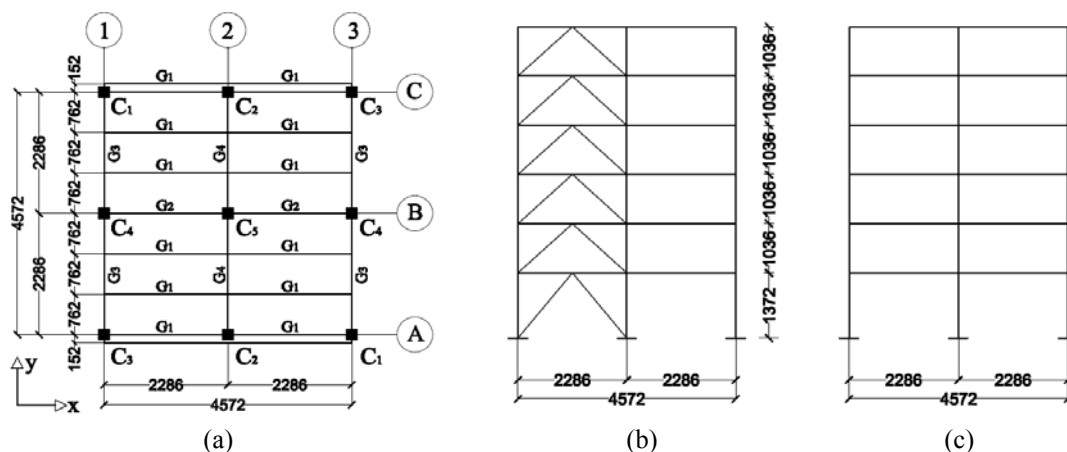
Test Uang and Bertero (1986): (a) the building structural plan; (b) the elevation frame B; and (c) elevation frame 1-2-3-A-C
